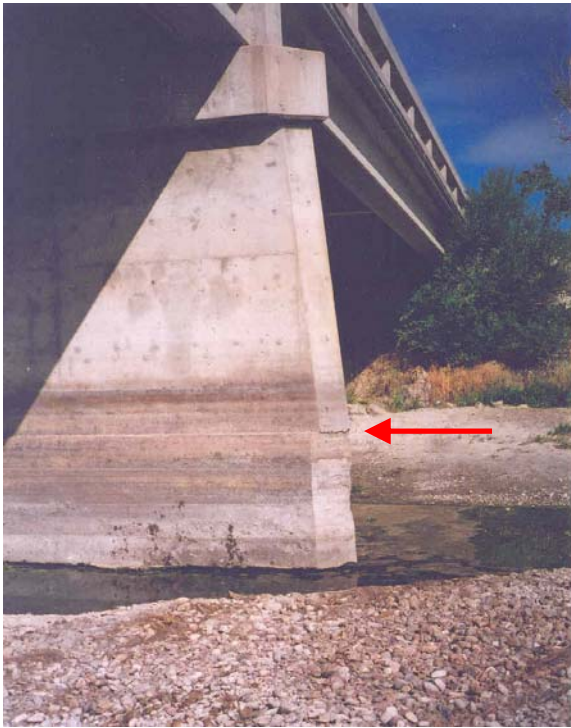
Looking at the downstream end of the Keystone Bridge pier that was constructed in 1979. The form marks on the pier show original channel bed elevation. The base of the pier ends a couple of inches above the water surface. The pier has a pile foundation which is currently exposed (Figure 4.3d) due to channel degradation and local scour.
